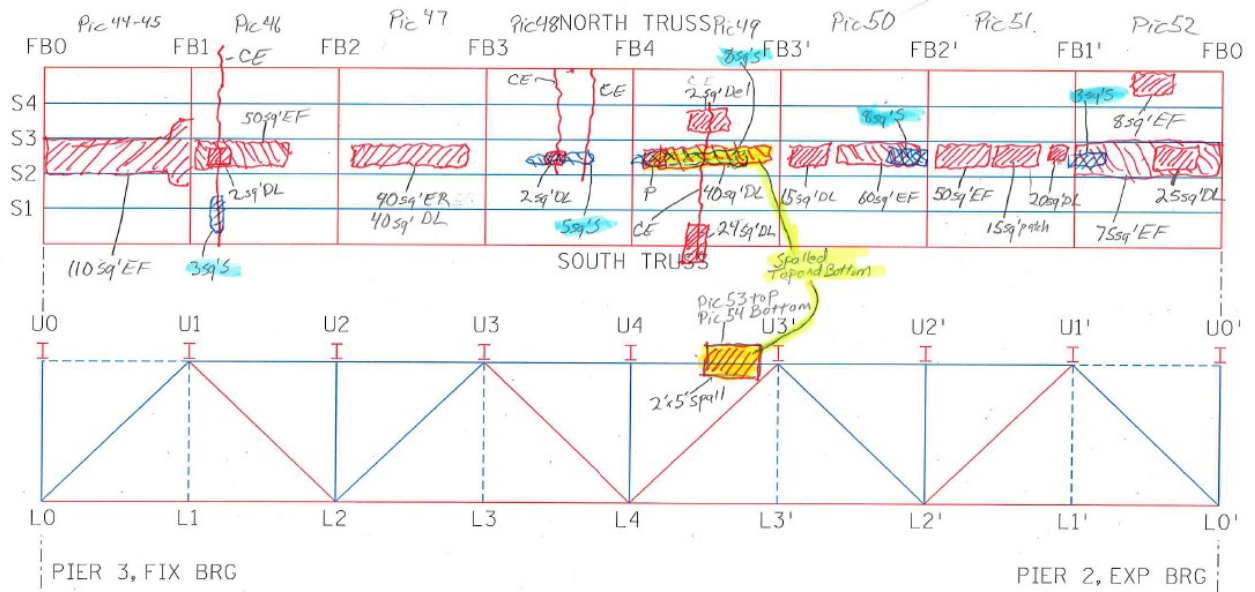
Underdeck and topside sounding performed in February 2017 (Span 3).
